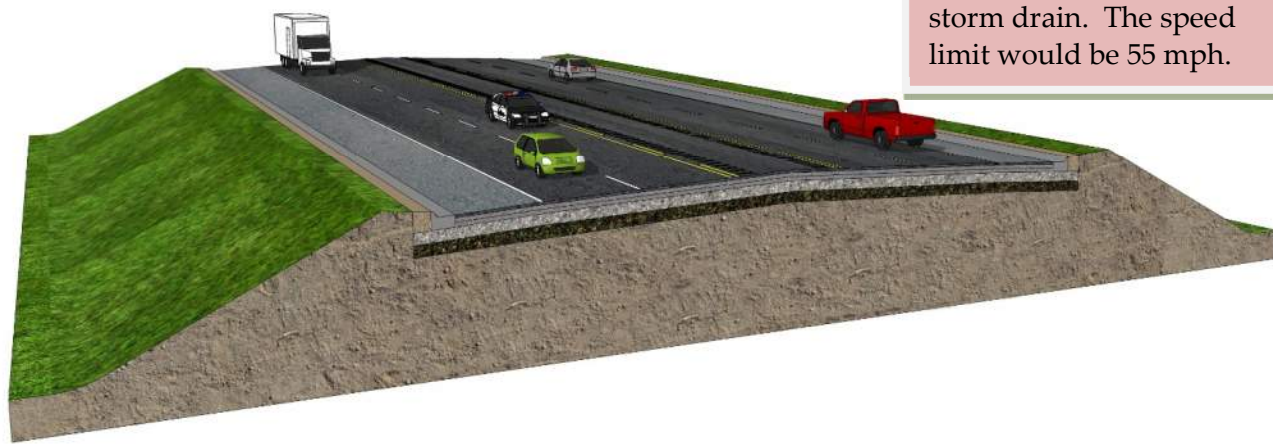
Alternatives 9, 10, and 11 Roadway Cross-Section
